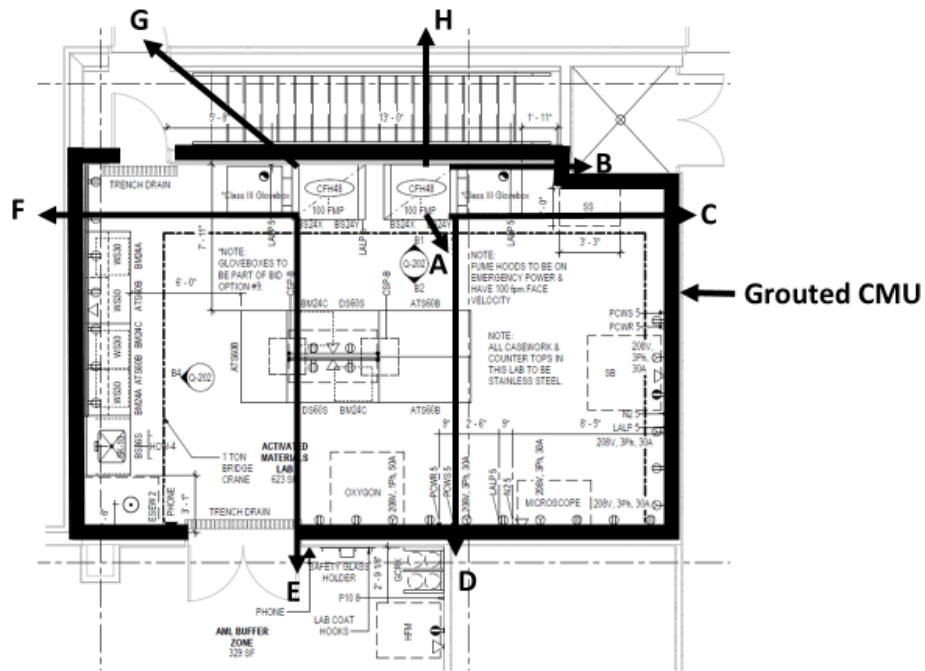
AML plan view showing grouted masonry wall and calculated dose locations
